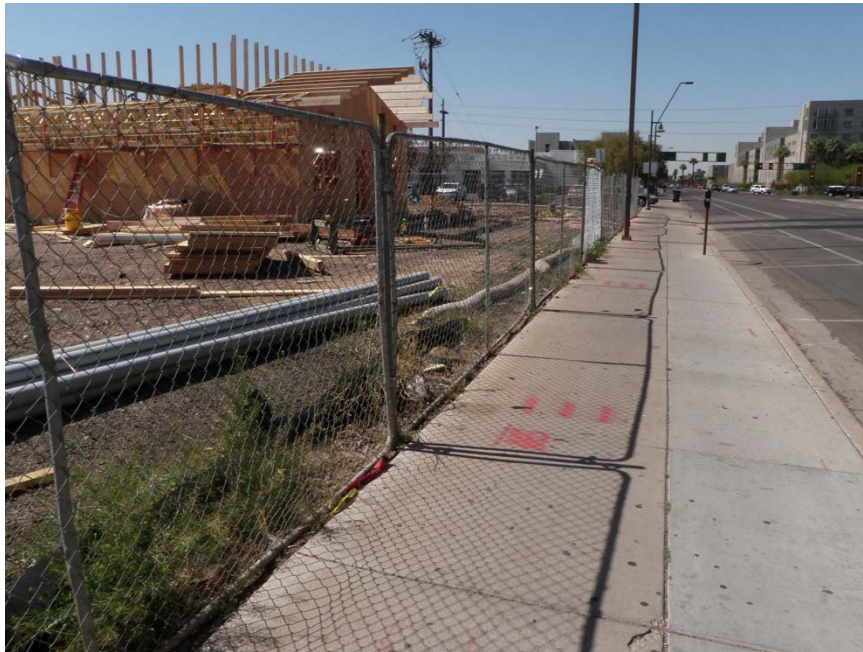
Lake Country Village – Straw wattles placed directly on asphalt. No on site controls used for soil stockpiles.
